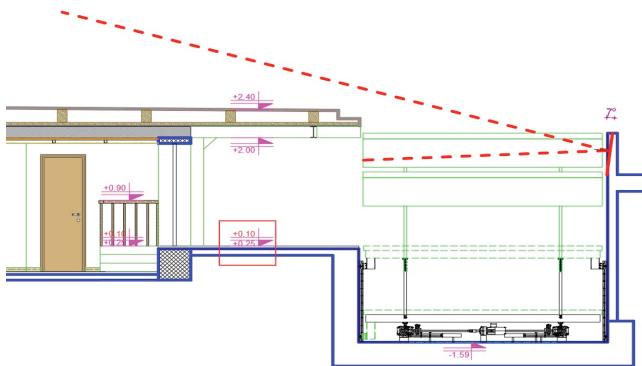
Orchestra pit parapet design to improve the propagation of sound from the Orchestra pit toward the stage and vice versa
